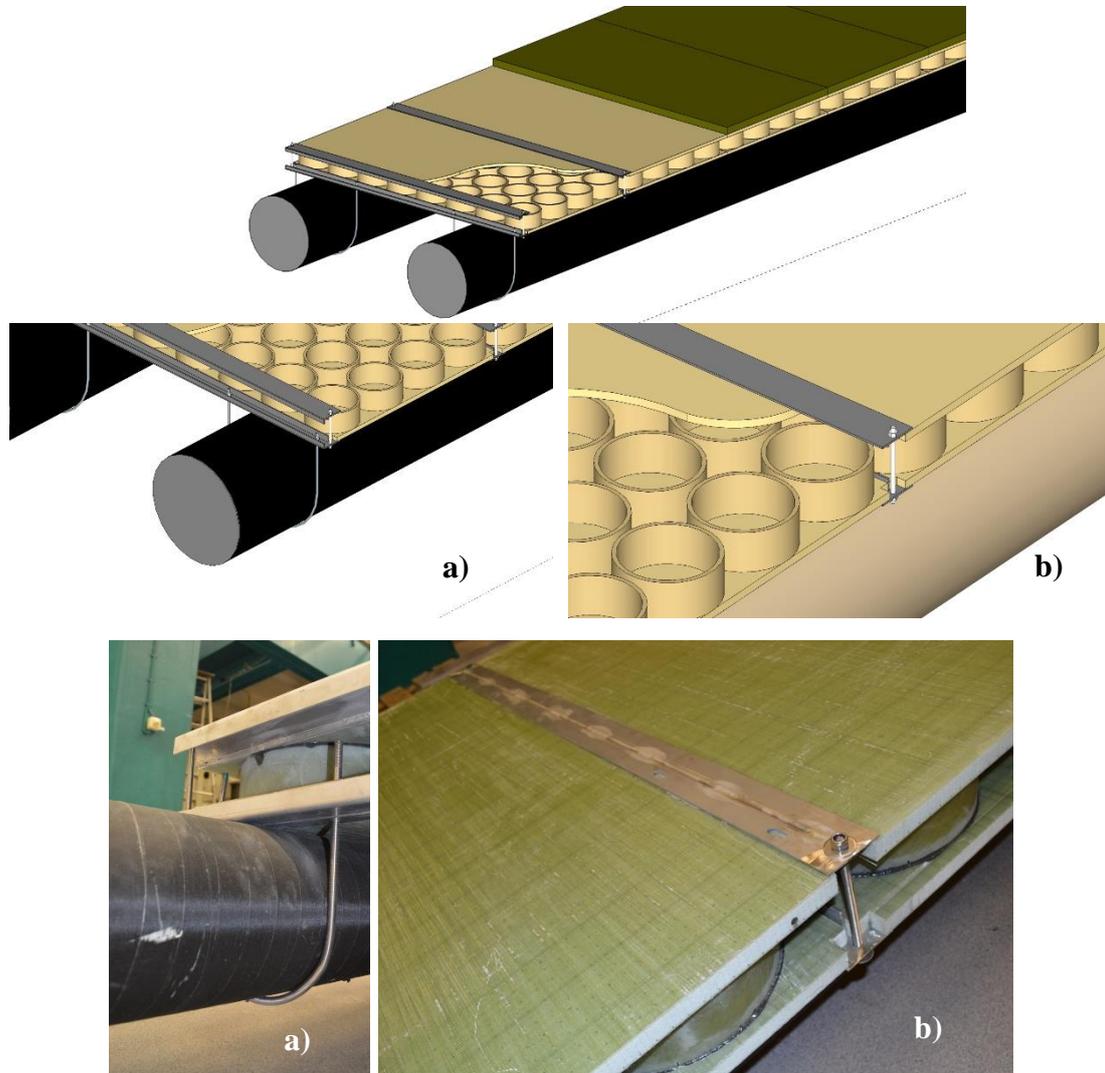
Connection: (a) bridge deck/girders; (b) Between panels
